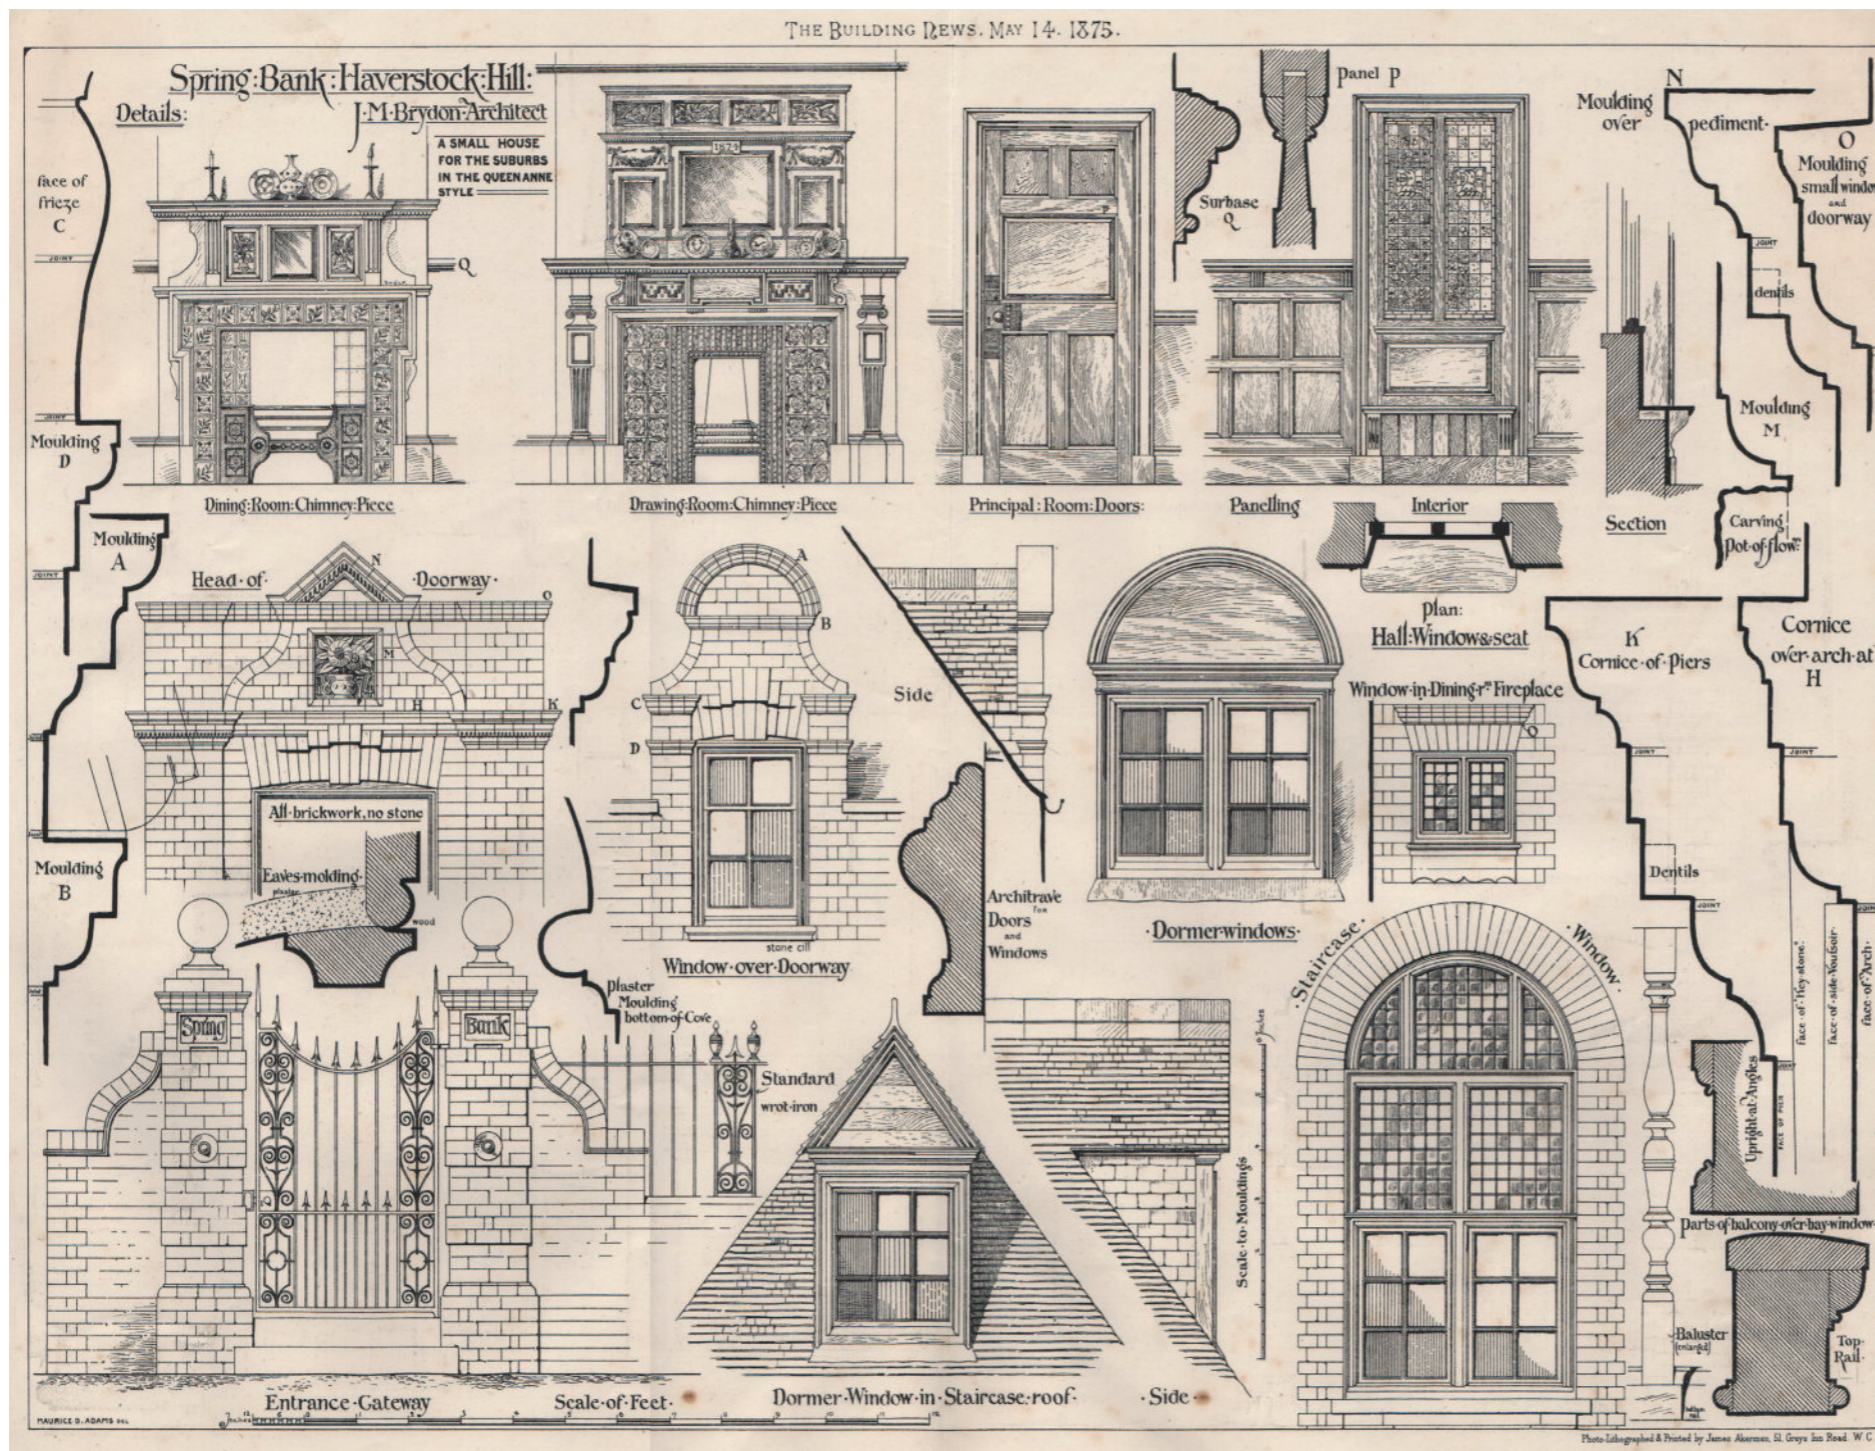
Exterior and interior architectural features, The Building News (1875)
